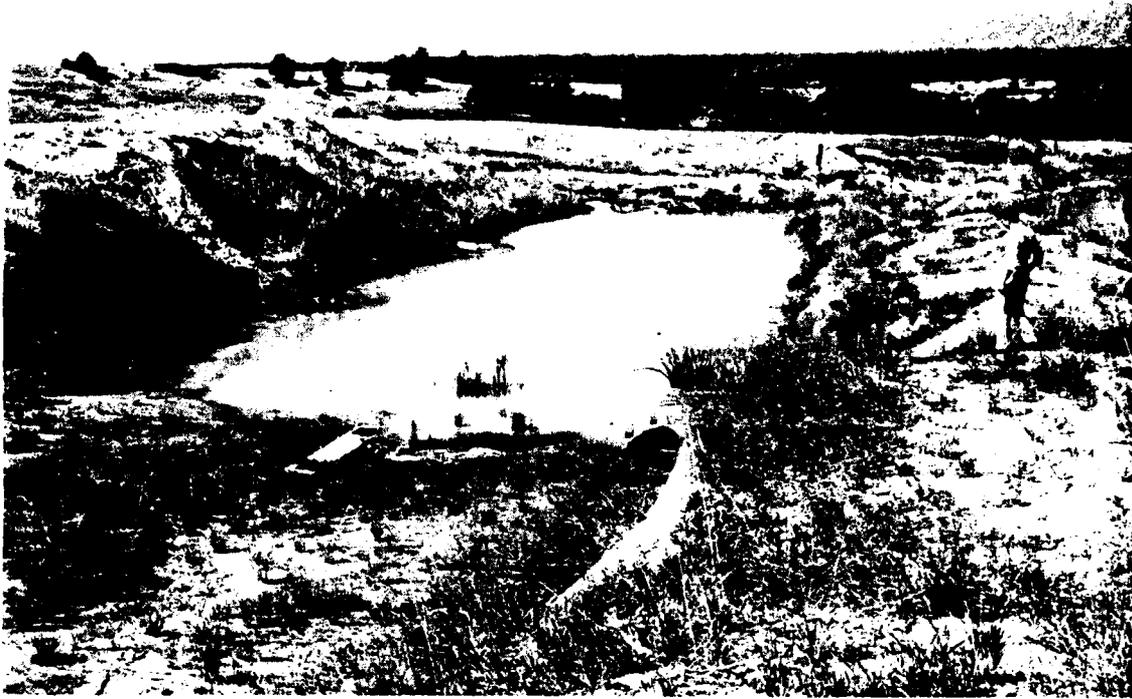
LANDFILL NO. 1 - OPEN TRENCH
